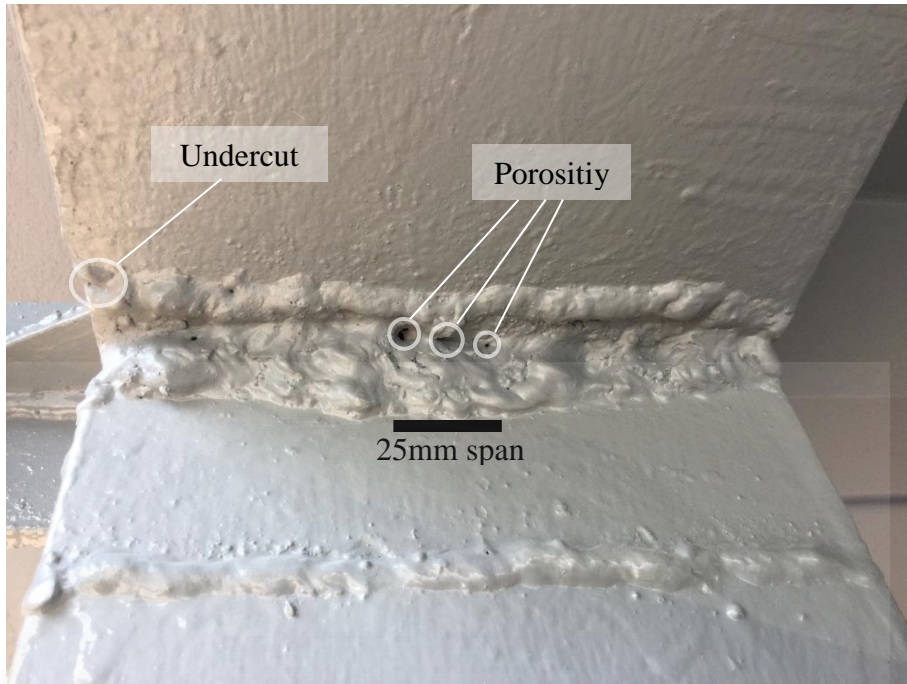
Welding defects on Steel Structure A (joint 3)
